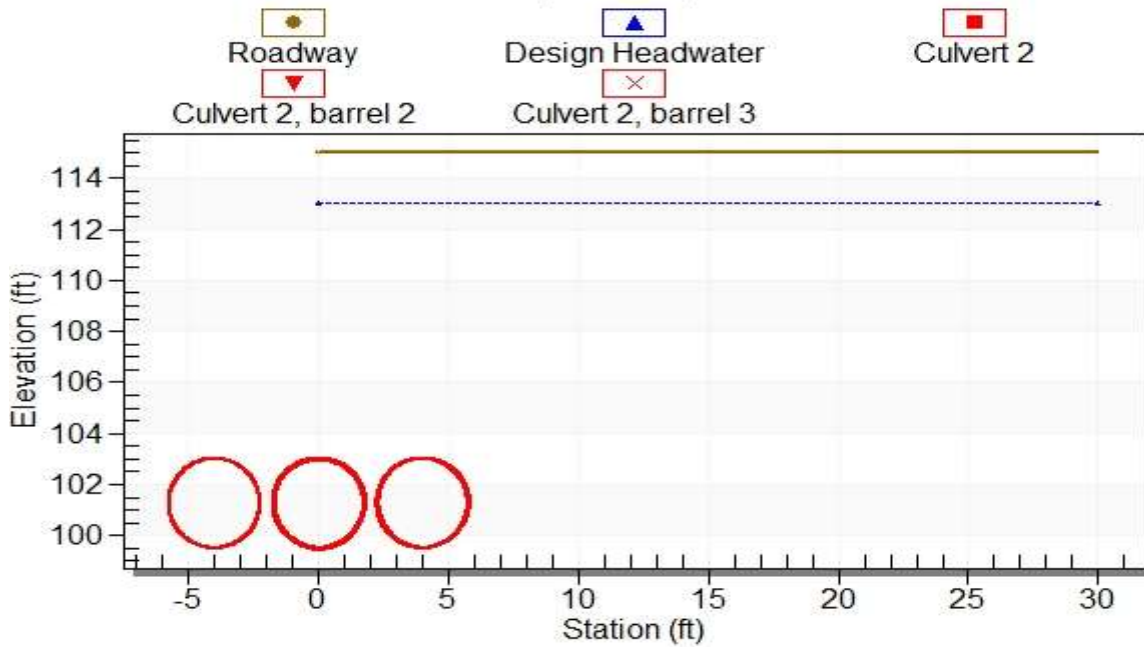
Crossing Front View (Roadway Profile): Circular Culvert (3.5ft Diameter)-3 Barrels
